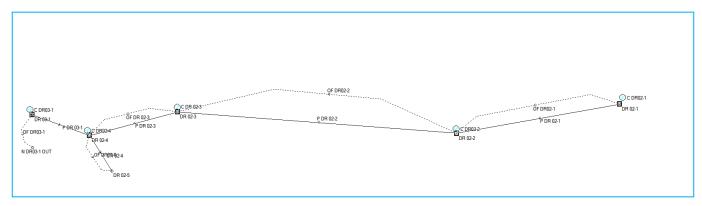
Set-up of DRAINS Model Showing the Proposed Kerb Inlet Pits within the Subdivision Accessway
